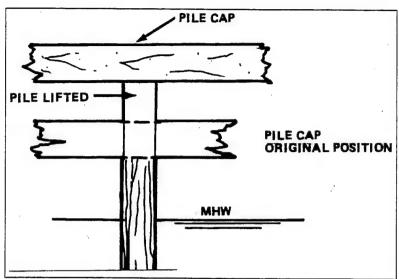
One potential consequence of steel connecting hardware failure in timber Construction.
